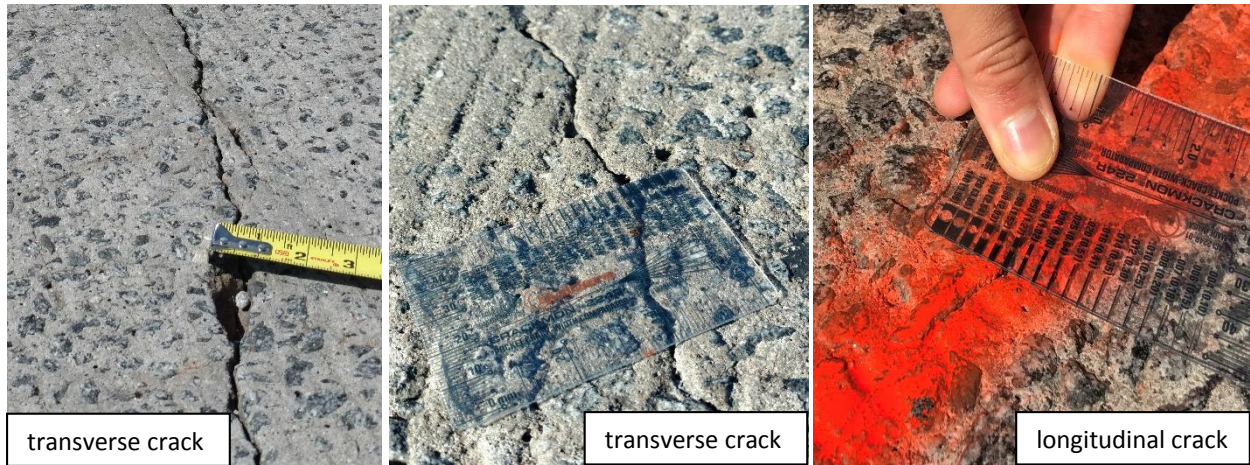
The Measurement of Non-Typical Crack Widths at S5-a and S5-d
